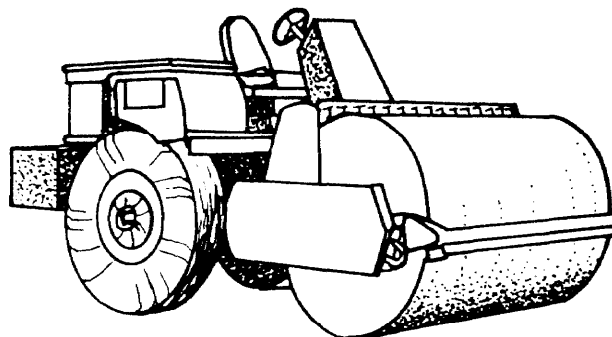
Self-propelled, smooth-drum vibratory roller.
